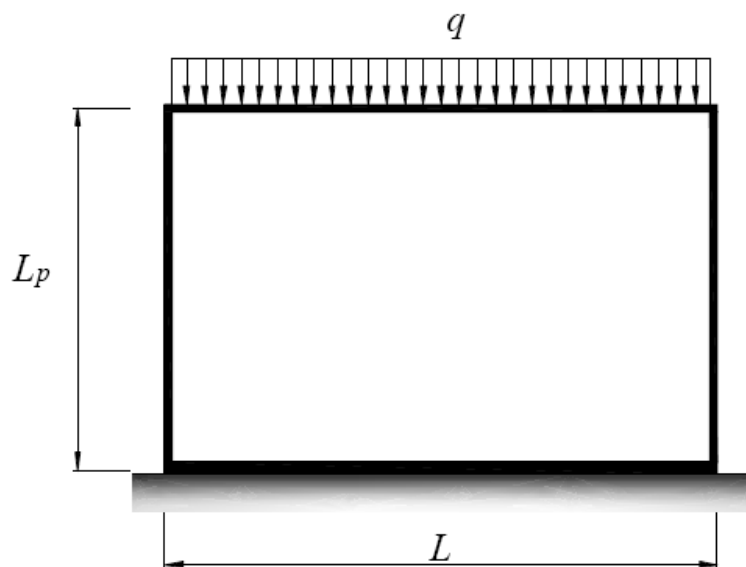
Pipe loaded by a distributed force at top beam.
